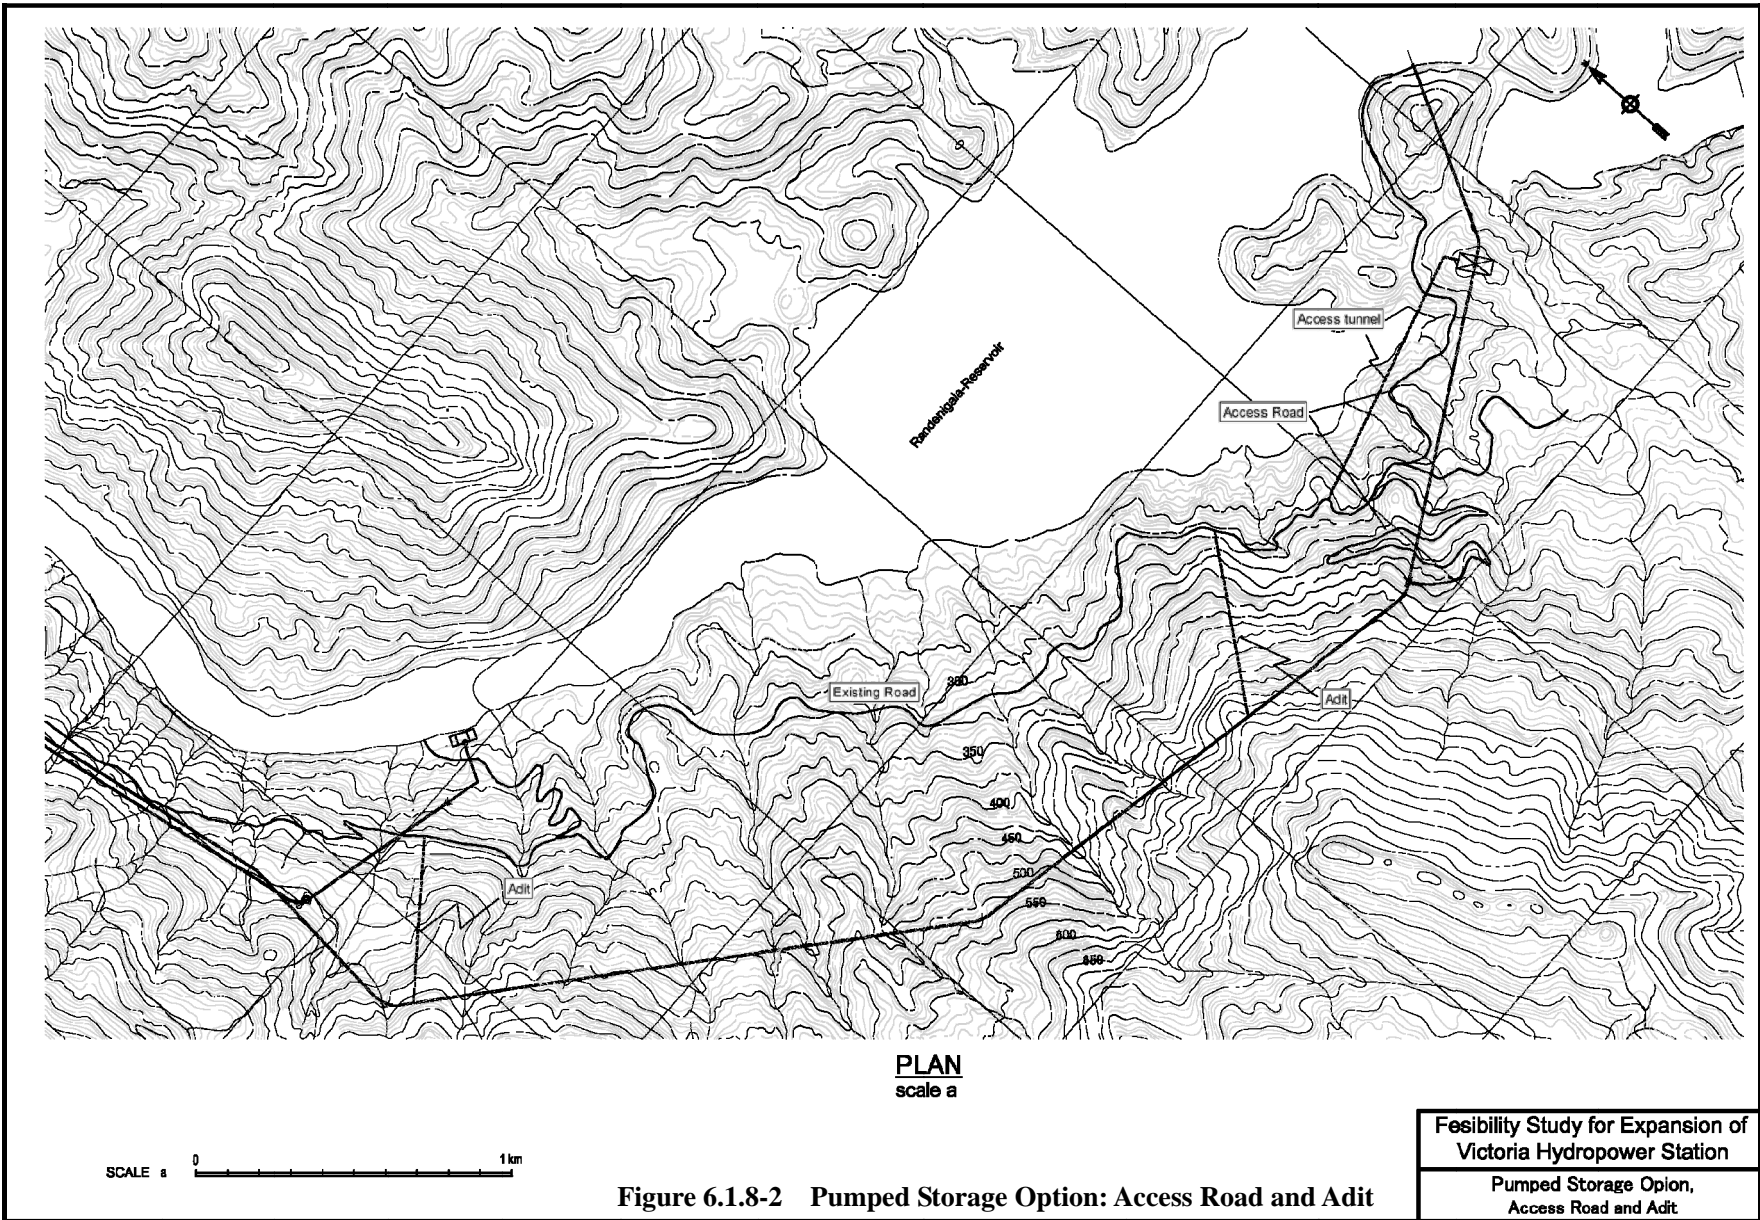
Pumped Storage Option: Access Road and Adit
